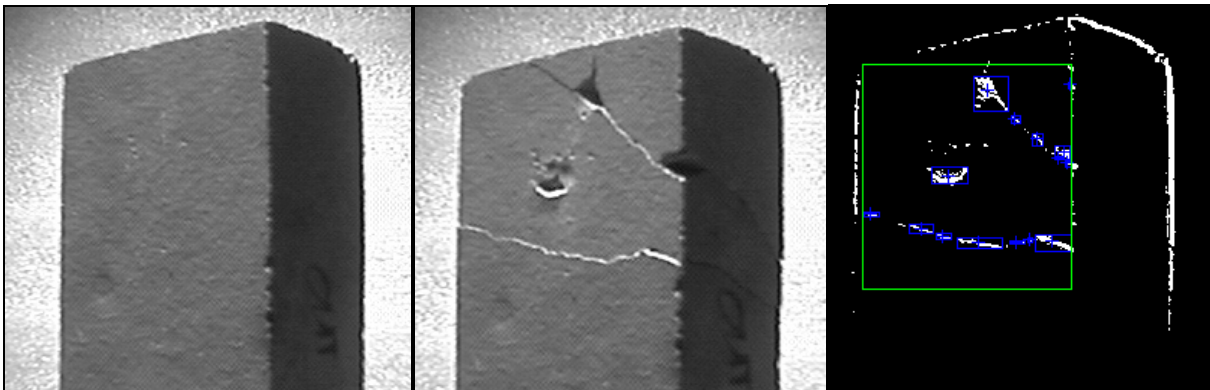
Undamaged brick, cracked brick, and ROI compare model.
